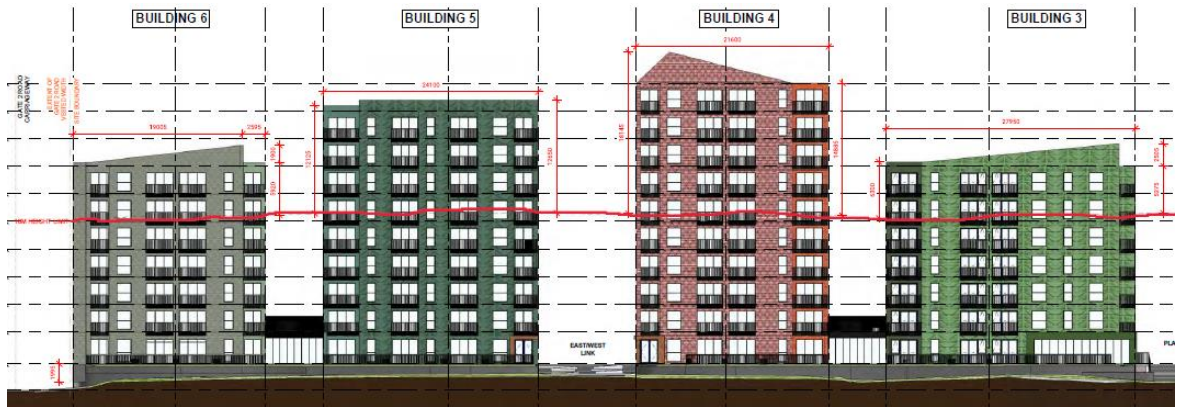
East Elevation of Maungārongo RC2 Buildings 3-6 to Carrington Road. The red line is the Wairaka Precinct's operative 18m height area along Carrington Road. Image source: Maungārongo RC2 architectural drawings.
